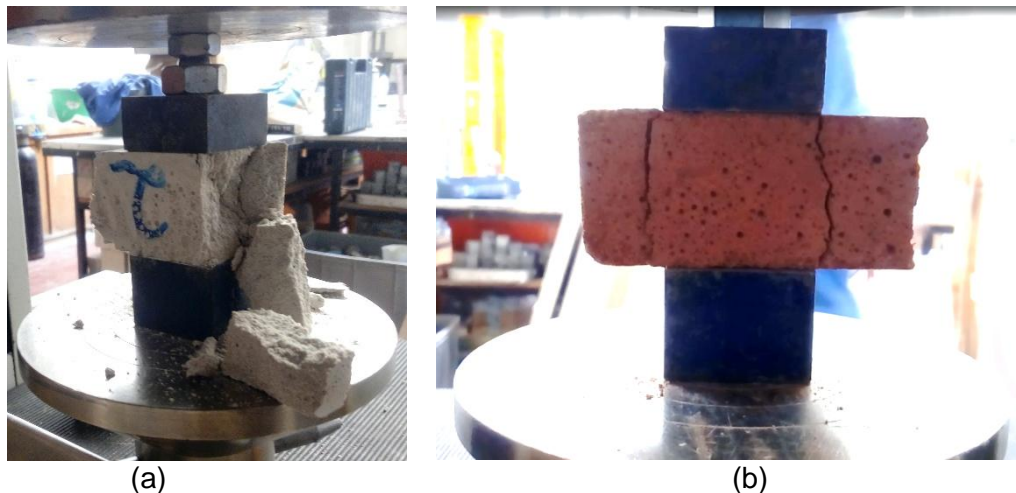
Destructive test for compressive strength on mortar specimens (a) failure of cement mortar M1 and (b) development of cracks in earth mortar M2.
